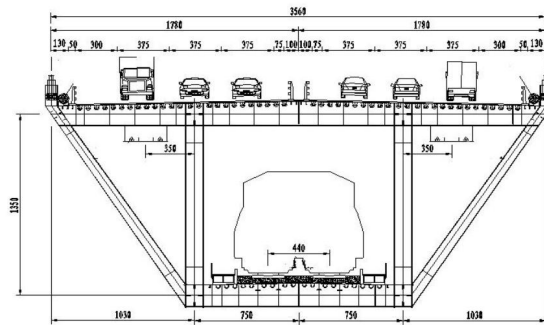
Lane design of the rail-cum-road bridge (unit: m).
